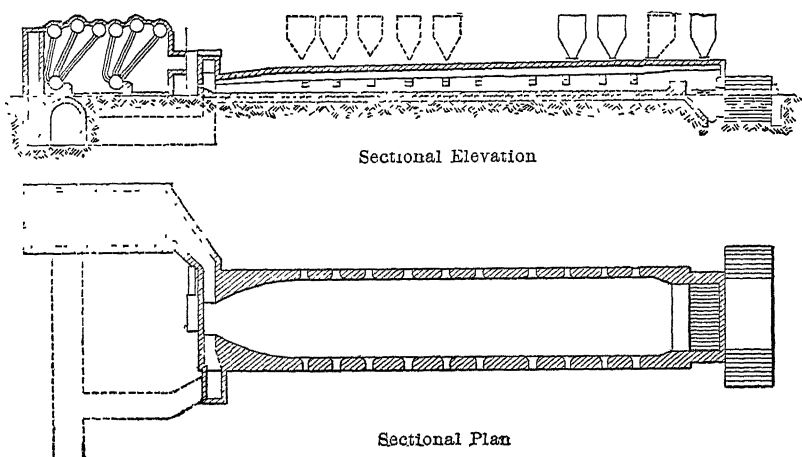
REVERBERATORY FURNACE No. 1, HAVING 115.8 FT. LENGTH OF HEARTH, WITH WASTE-HEAT BOILER-SETTING.
